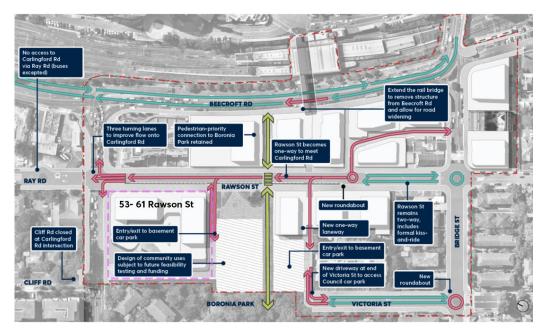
Potential Traffic Upgrades in the Draft Epping Town Centre Master Plan
